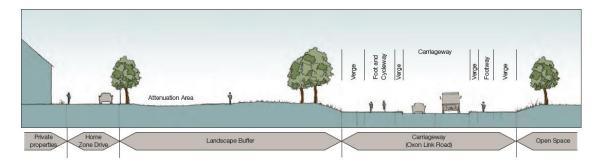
Typical cross section on Oxon Link Road (Source: SUE West Masterplan)
